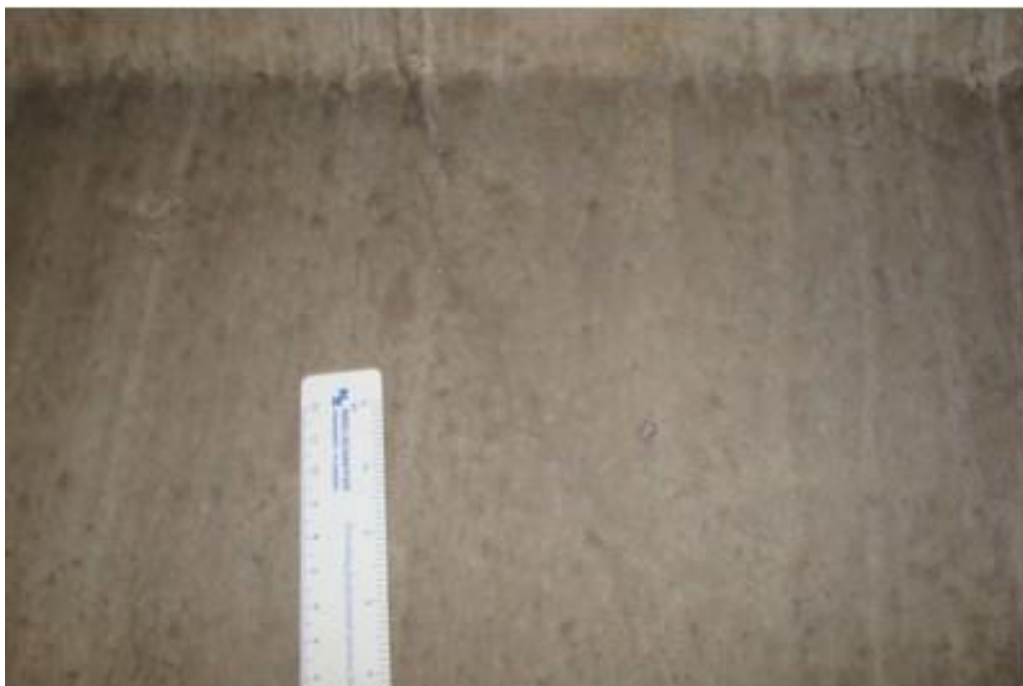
Cracks, girder at south span, north end, 4th beam from west side, west face (#7933).
